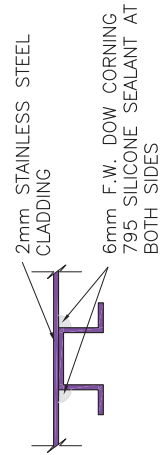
(END SUPPORT DETAILS OF STIFFENER AT CLADDING EDGE)
